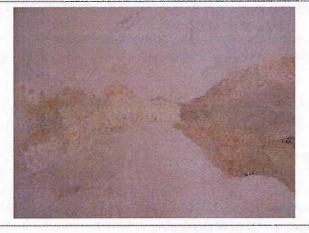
Urethane traffic membrane delaminated at the drive aisle south of parking stall 156.
